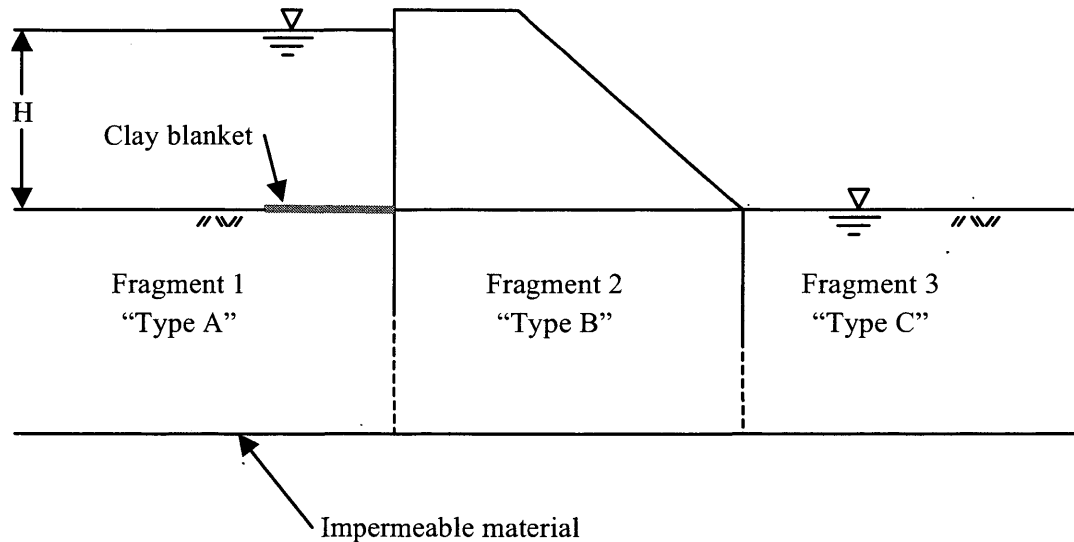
Gravity dam on a porous foundation, shown divided into fragments.
